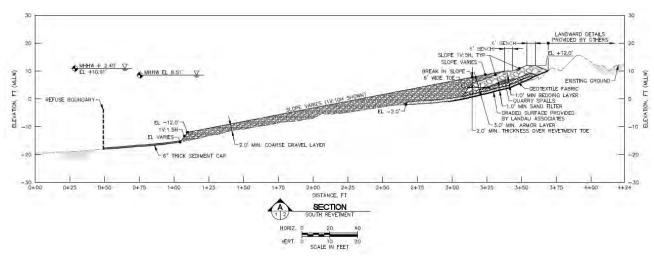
Typical cross-section of south gravel cobble beach with revetment
